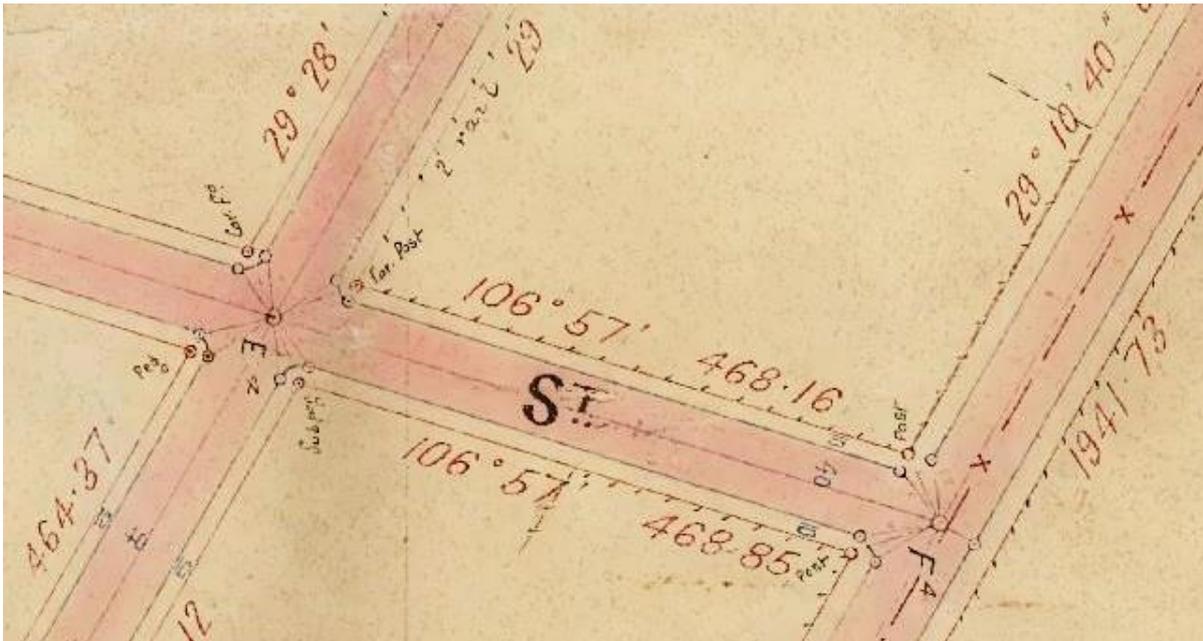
Detail from Alignment Plan H4-2110 (1896).
